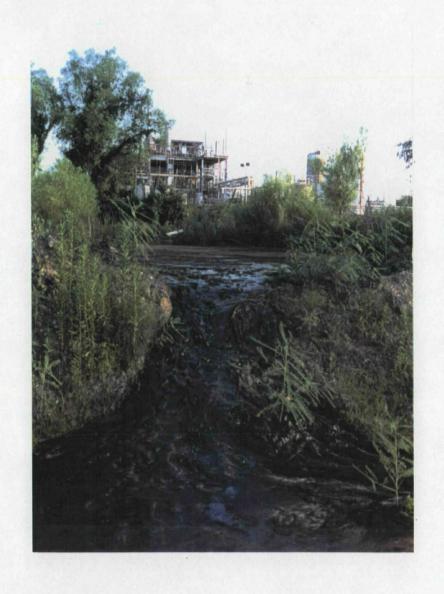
Roll N 1 Frame N: 21 Date: 6/25/92 Subject: Looking south from E-O tank area, of breached dike wall.
